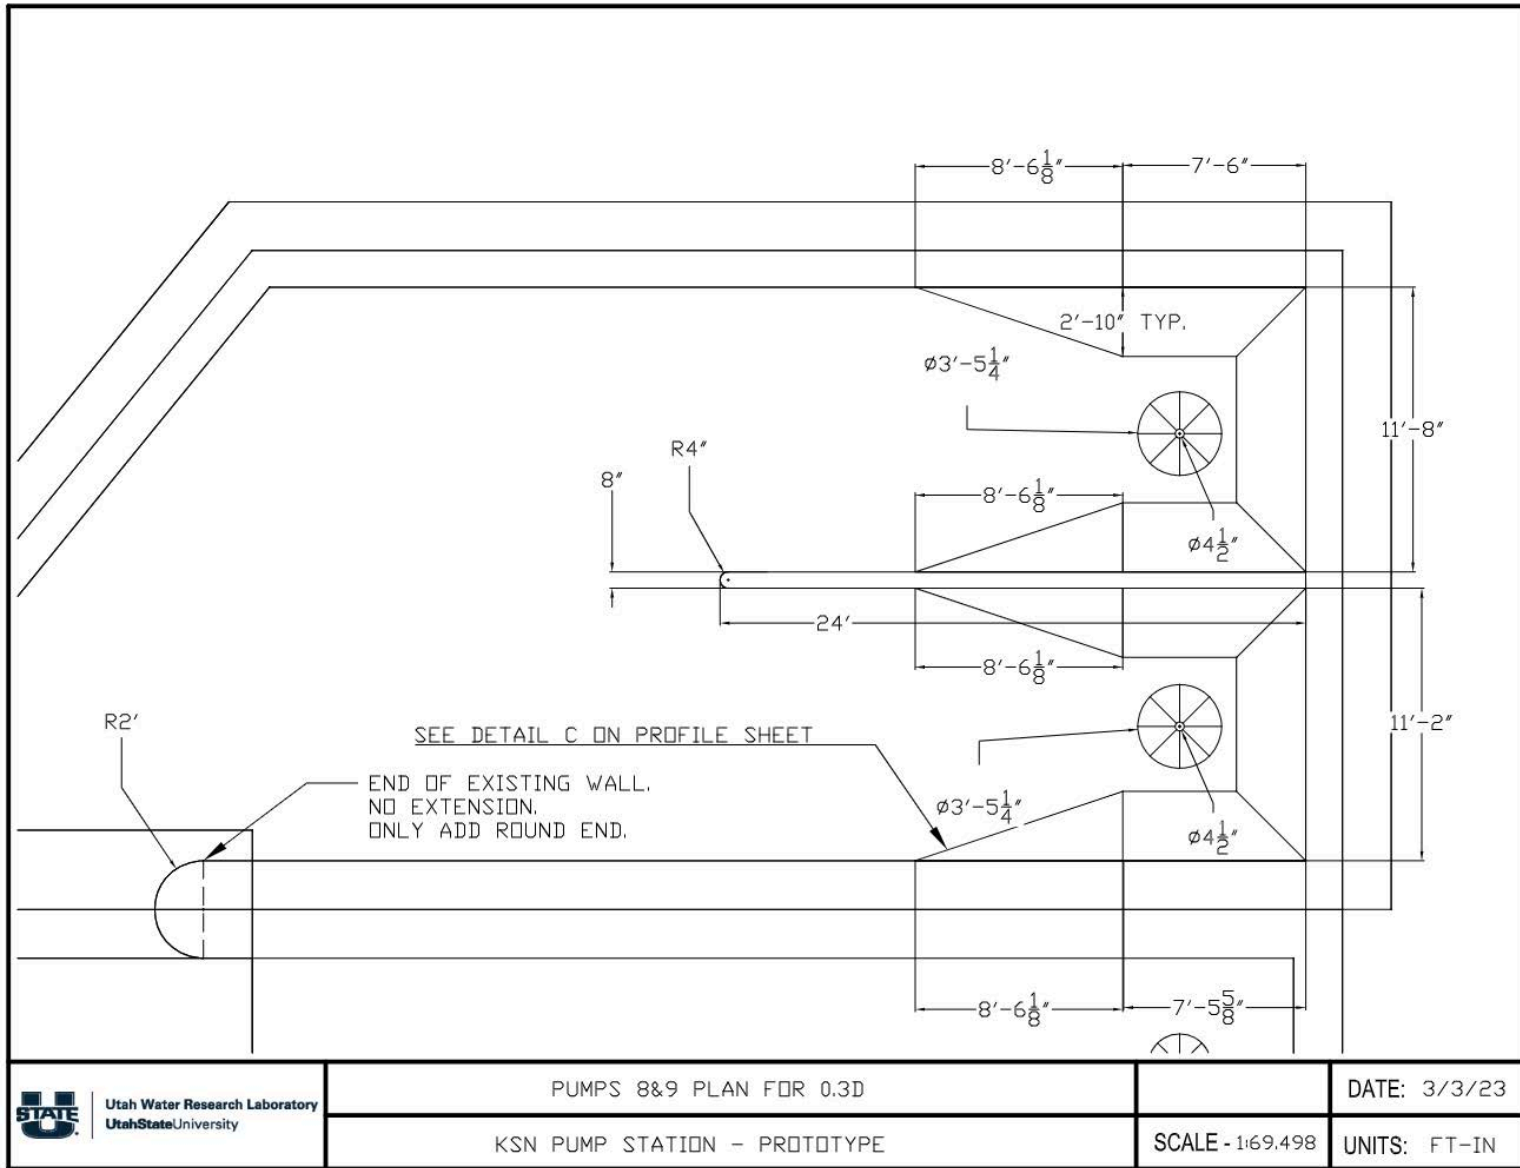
Final fix for pumps 8 and 9 (plan view prototype dimensions)
